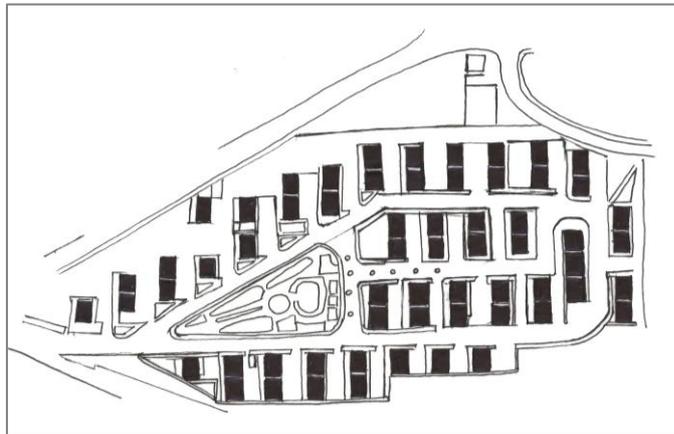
Site plan of Farhangshahr Housing Project(Sketched by the Author)
